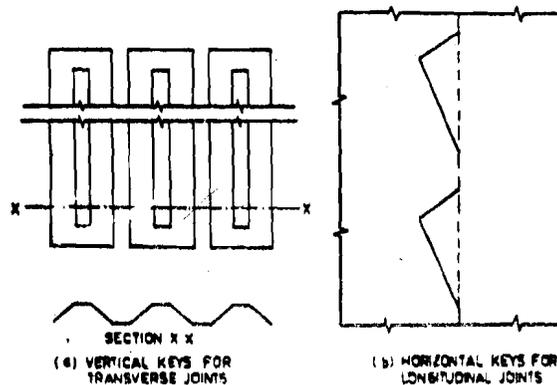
Typical Keys for Joints in Gravity Dam
